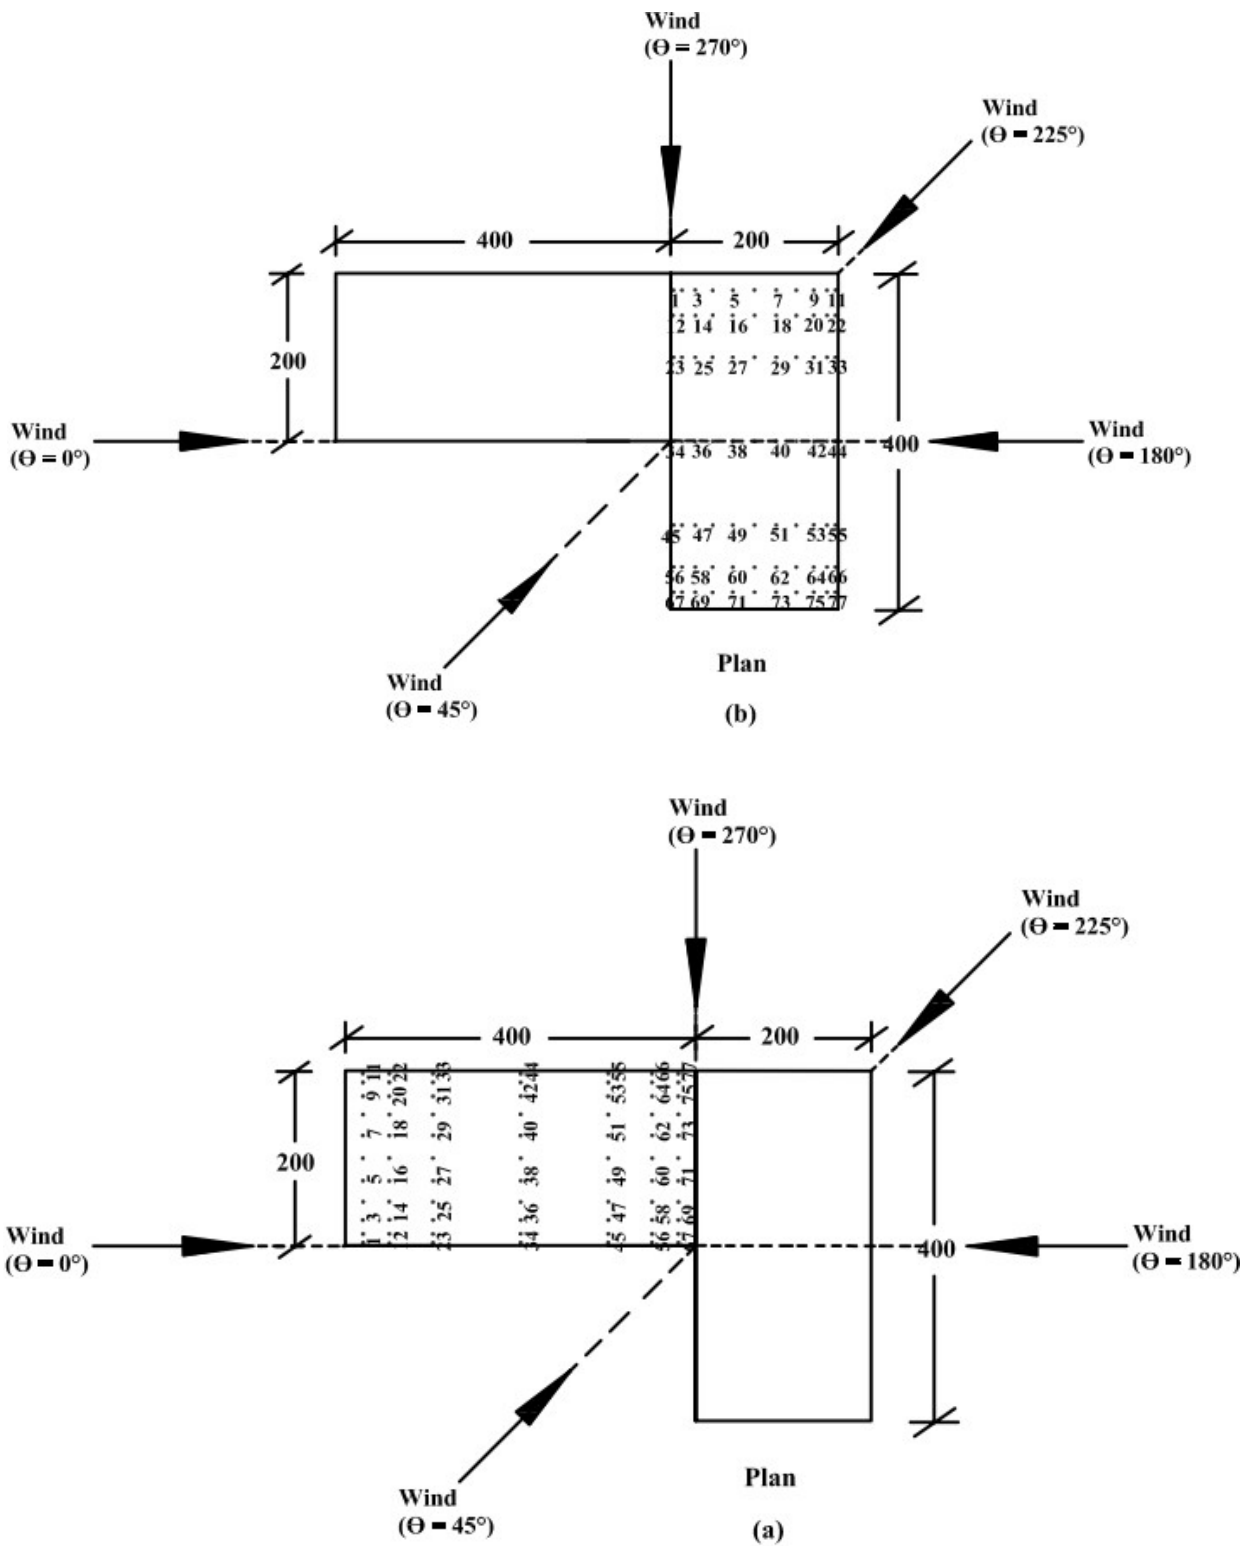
Wind directions on the model of two buildings with convex type cylindrical roof arranged in L-shape
